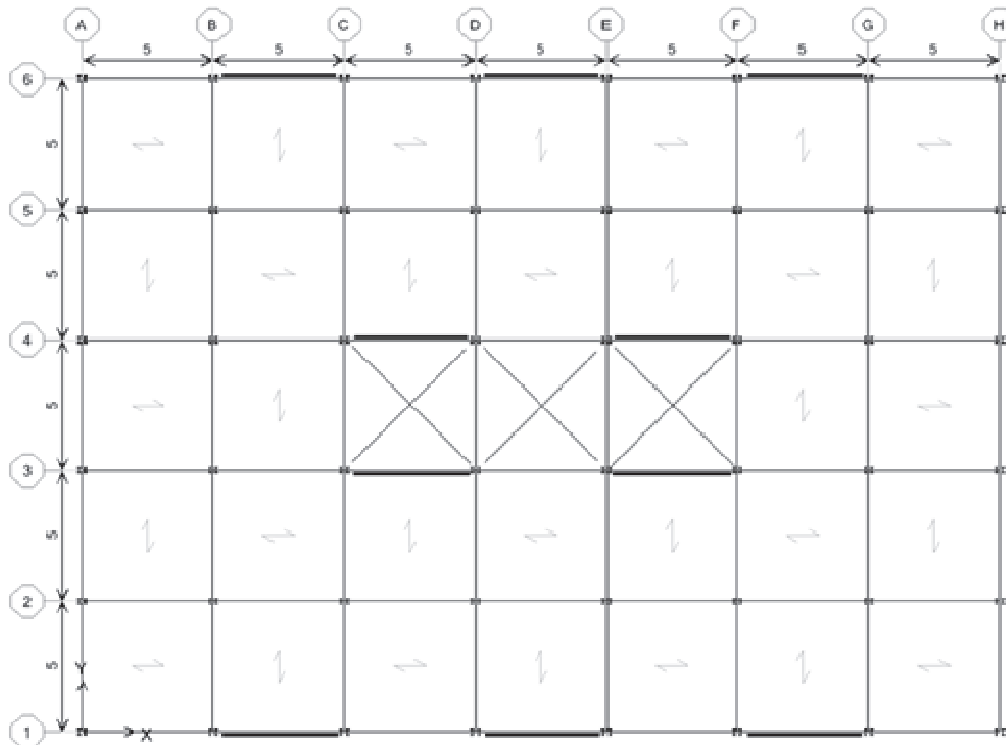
Large plan (35m x 25m) for 3, 6 and 10 story buildings and locating of braces.
